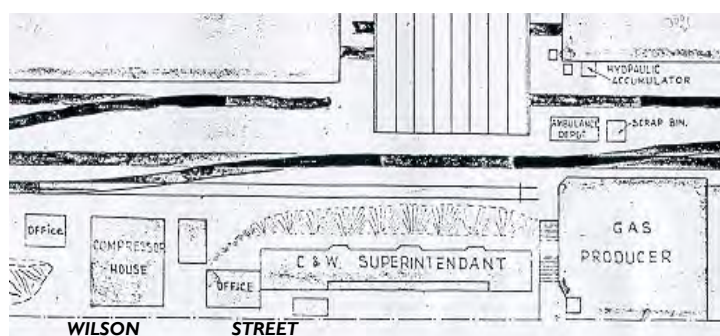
The 'middle' section of the site along the Wilson Street boundary in 1926. Source: SRA Plan Room Drawing 1041/22, 034.
